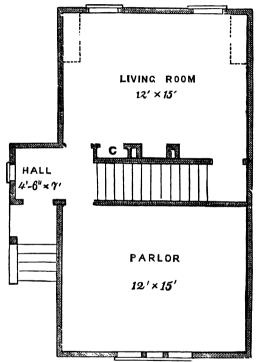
FIRST STORY.—Scale, 8 feet to 1 inch.
